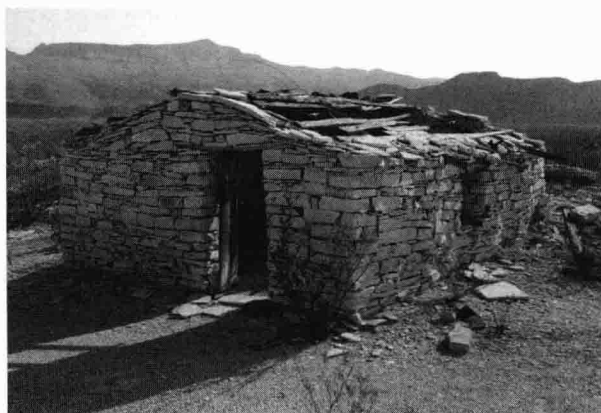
The stone houses at Mariscal were constructed from the local rock with wood for doors, window frames, and roofing support. While this house exhibits horizontal stone coursework, other stone houses at Mariscal were built with a variety of coursework styles. See the house in HAER photo 48 in the Mariscal collection for an interesting comparison with the house above. HAER photo by Bruce Harms.
